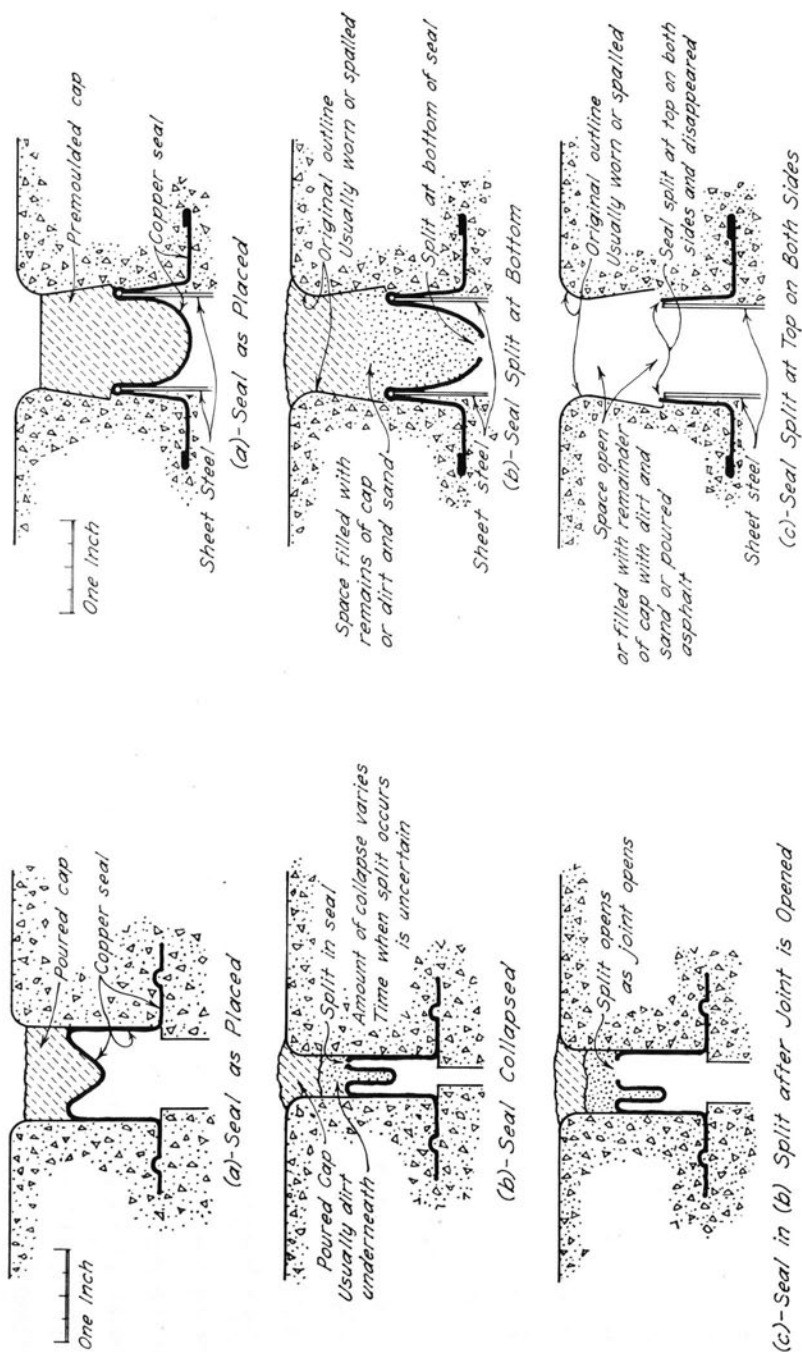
(AT LEFT). TYPICAL FAILURE OF J-4 EXPANSION JOINT SEALS IN SERVICE
